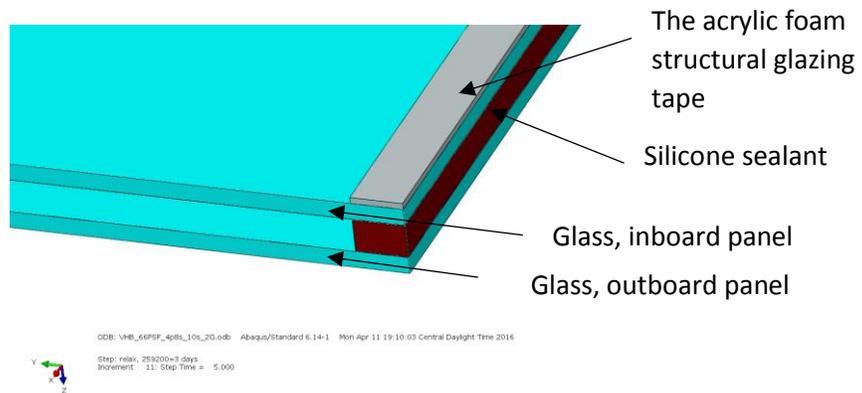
Cross section (shown here is only the right portion of AA cross section in Fig. 3) of the finite element model of the double pane glass panel. The perimeter of the inboard and outboard glass panels was sealed with silicone sealant
